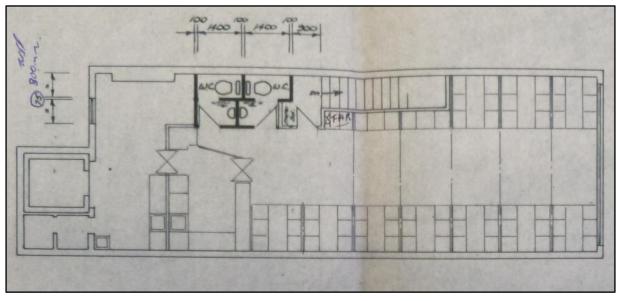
Detail from 1981 plan showing alterations to the ground layout of the building at 5 Dee Street (Hopgood, 1981).
